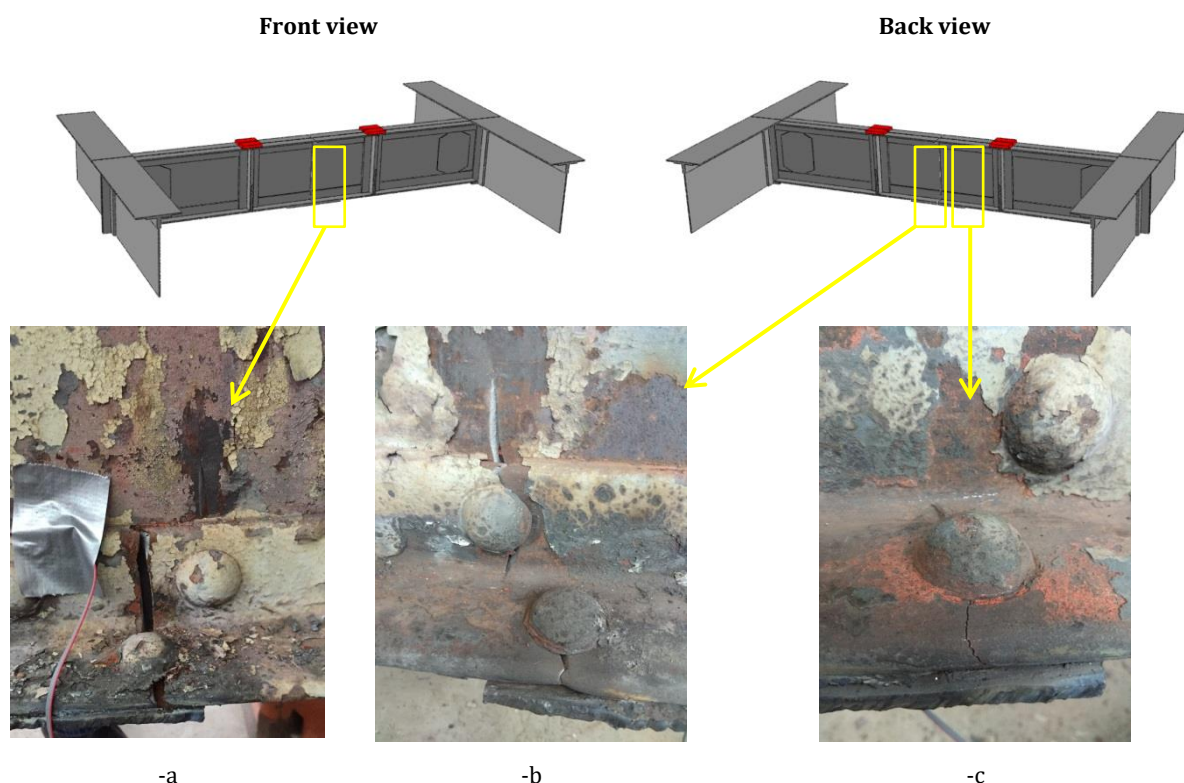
Fatigue cracks observed at the end of the experimental investigation: front (-a) and back (-b) views of first fatigue crack and (-c) back view of the second crack.
